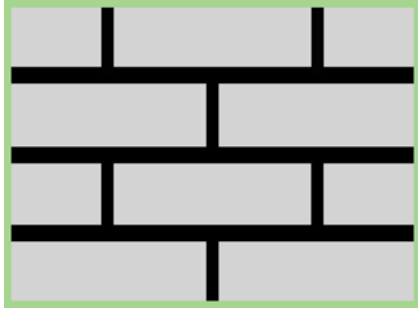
RVE of the virtual laboratory for a small masonry wall specimen of Example 5.1
